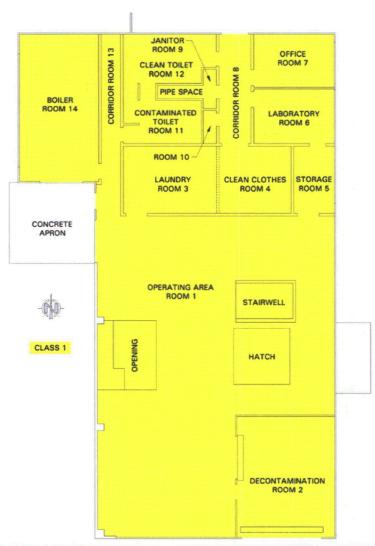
, WHB First Floor Layout and Survey Unit Identification
